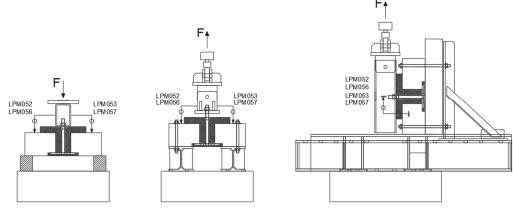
Hinge connection test setup: compression (left) tensile (centre) and shear (right)
